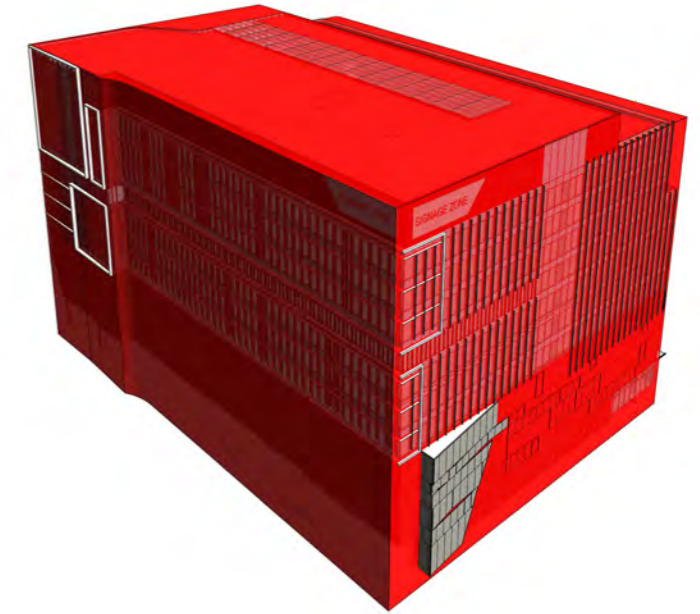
Parameter Plan envelope overlay. Aerial view at north west corner.
